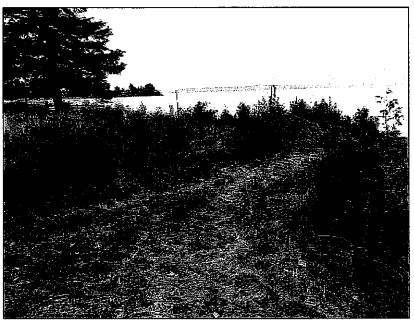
View north east. Temporary construction access route to staging area. This area was previously disturbed for planting and beach restoration (restoration plans attached).
